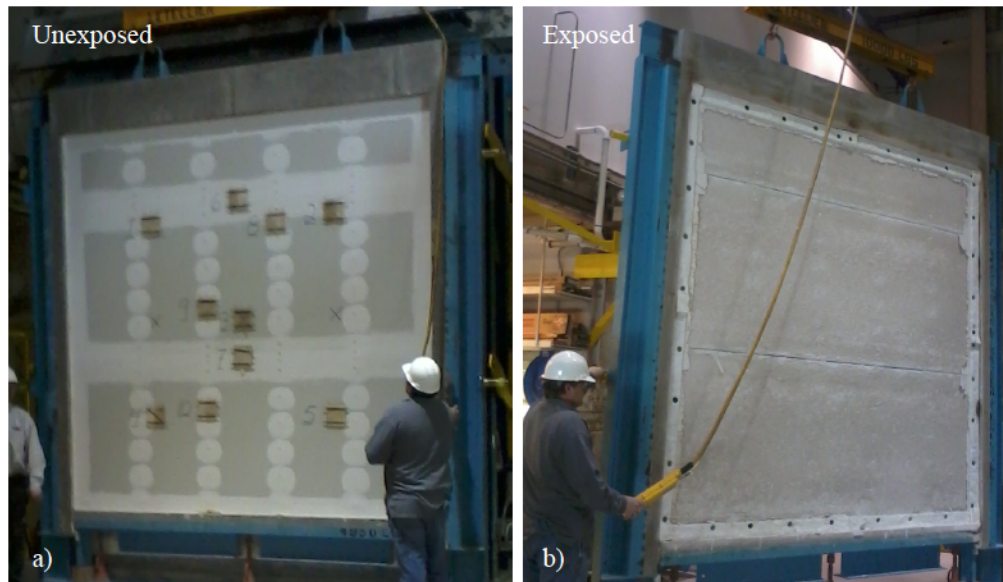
a) Unexposed and b) exposed boards after standard fire test
